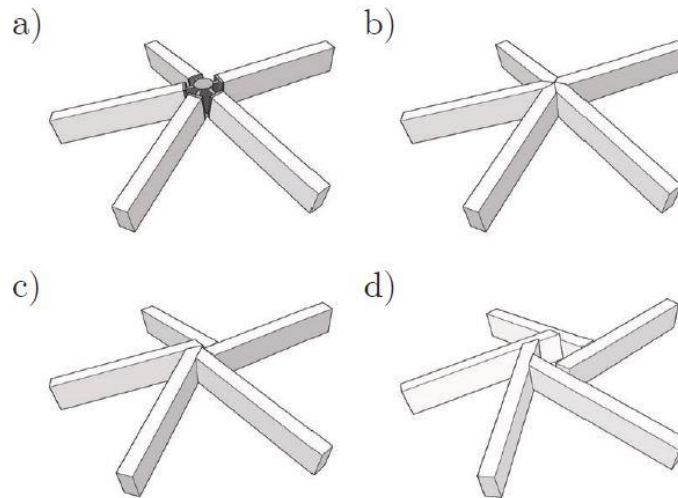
Structural joint conditions: a) a knot with multiple bars meeting in one point with or b) without an additional joint element, c) an expanded node with a minimum expansion and d) expanded node with larger expansion (Apolinarska, 2018).
